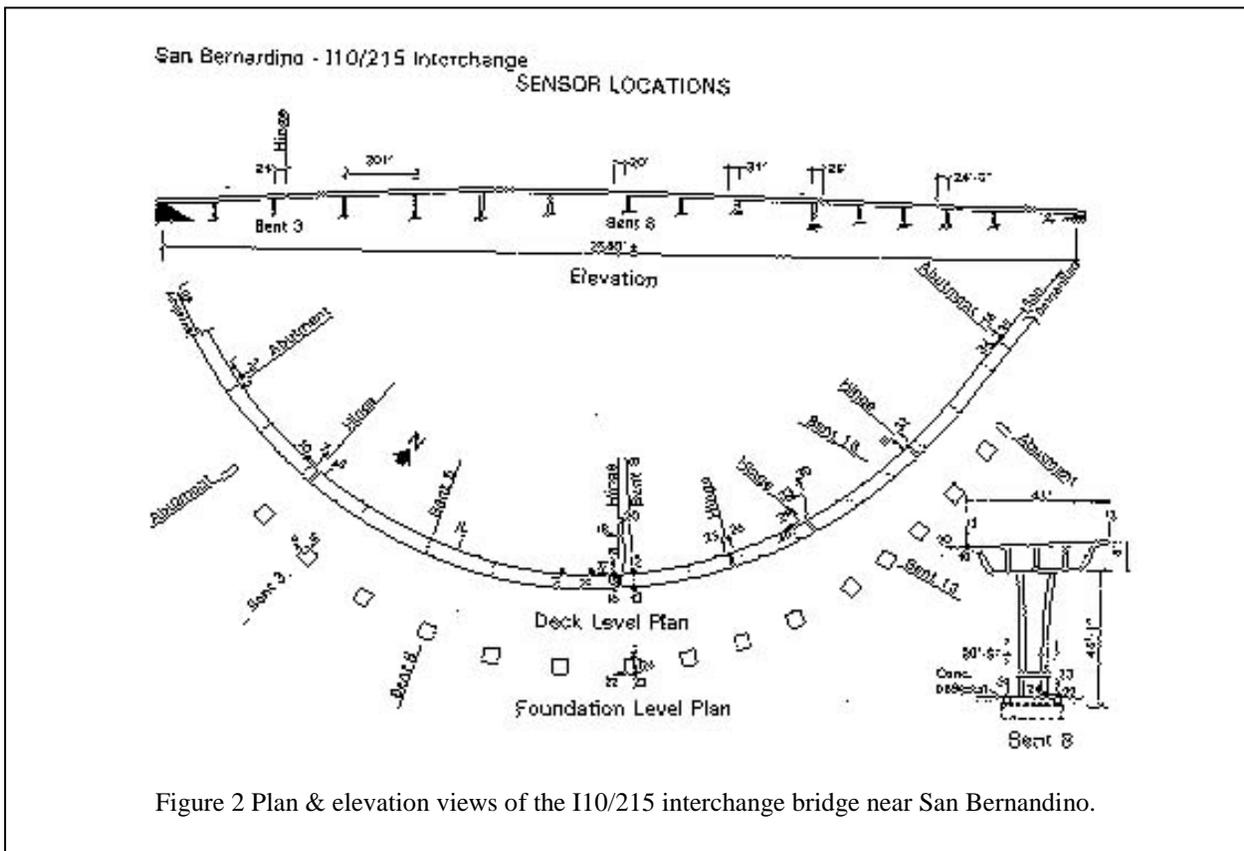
Plan & elevation views of the I10/215 interchange bridge near San Bernardino.
